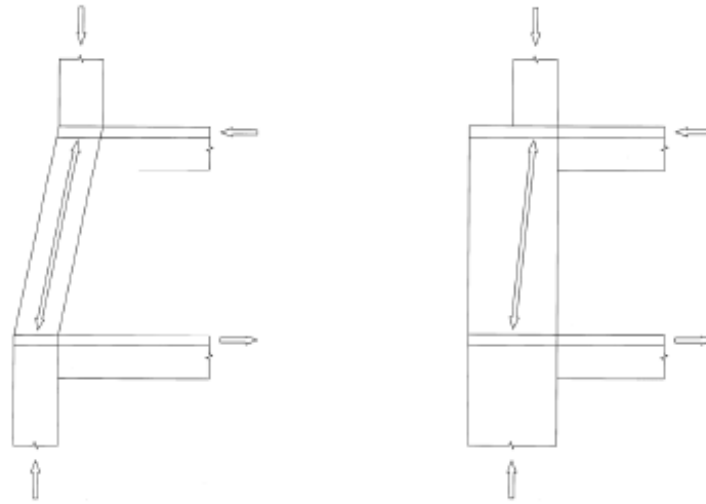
Diaphragm forces due to sloped column (Scarry, 2014)
